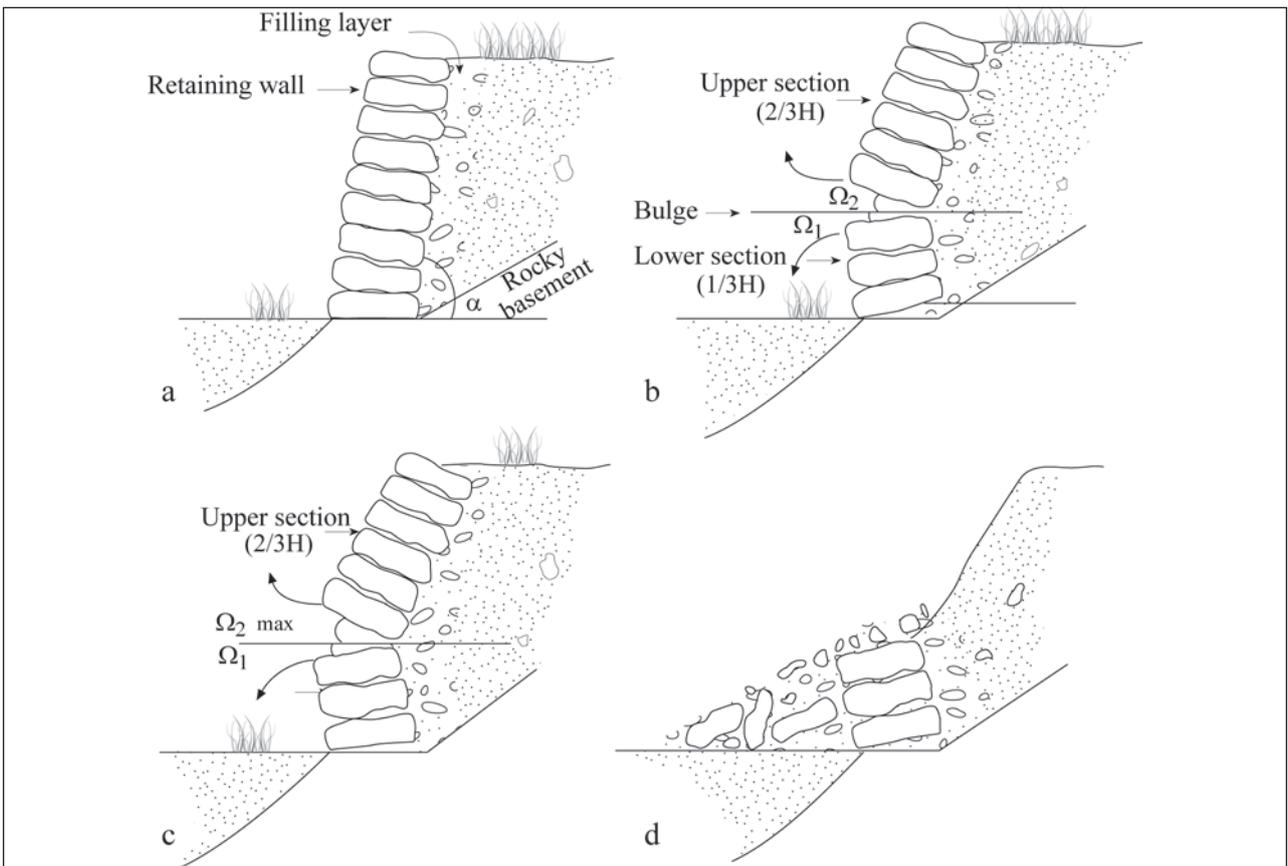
Stages in the process of wall collapse: a) retaining wall; b) bulge on the 1/3 lower section; c) bulge collapse; d) wall collapse.
